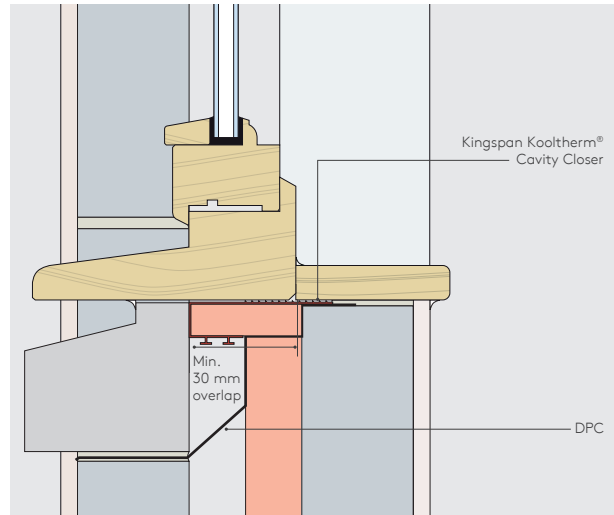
Sill Detail Incorporating Kingspan Kooltherm® Cavity Closer
